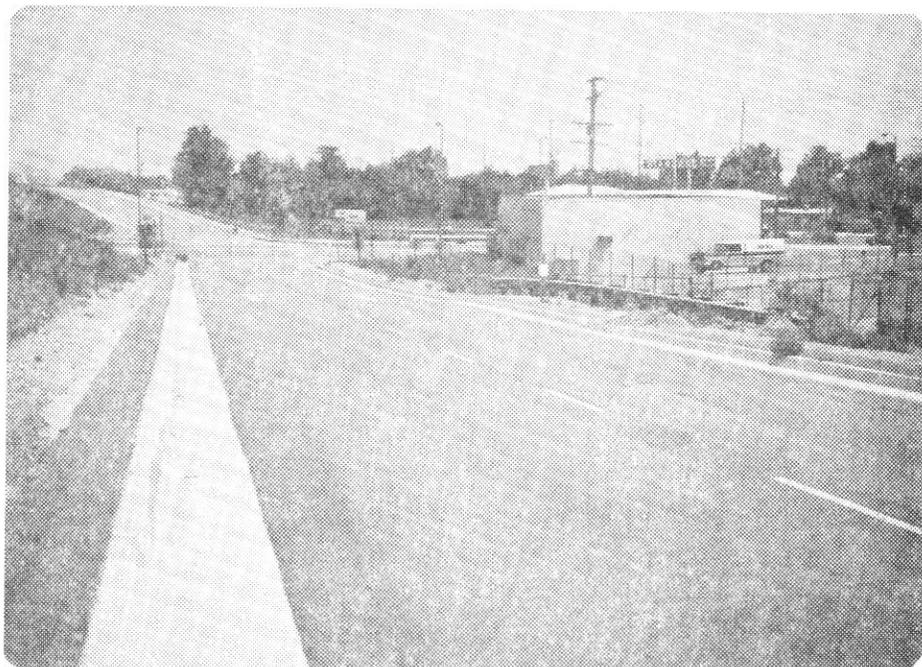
Eastbound off ramp to Polk Street. Note "hump" in pavement over underlying drainage structure.
